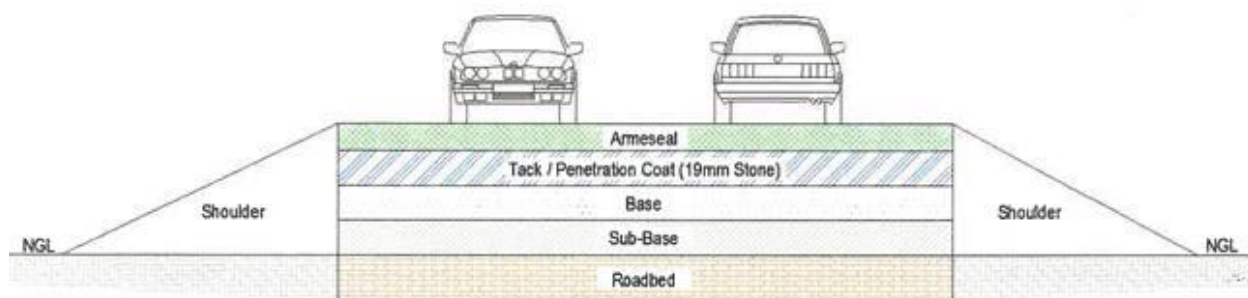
Proposed typical cross-section of road layers constructed with SprayCo Armaseal, (Adopted by HEC
